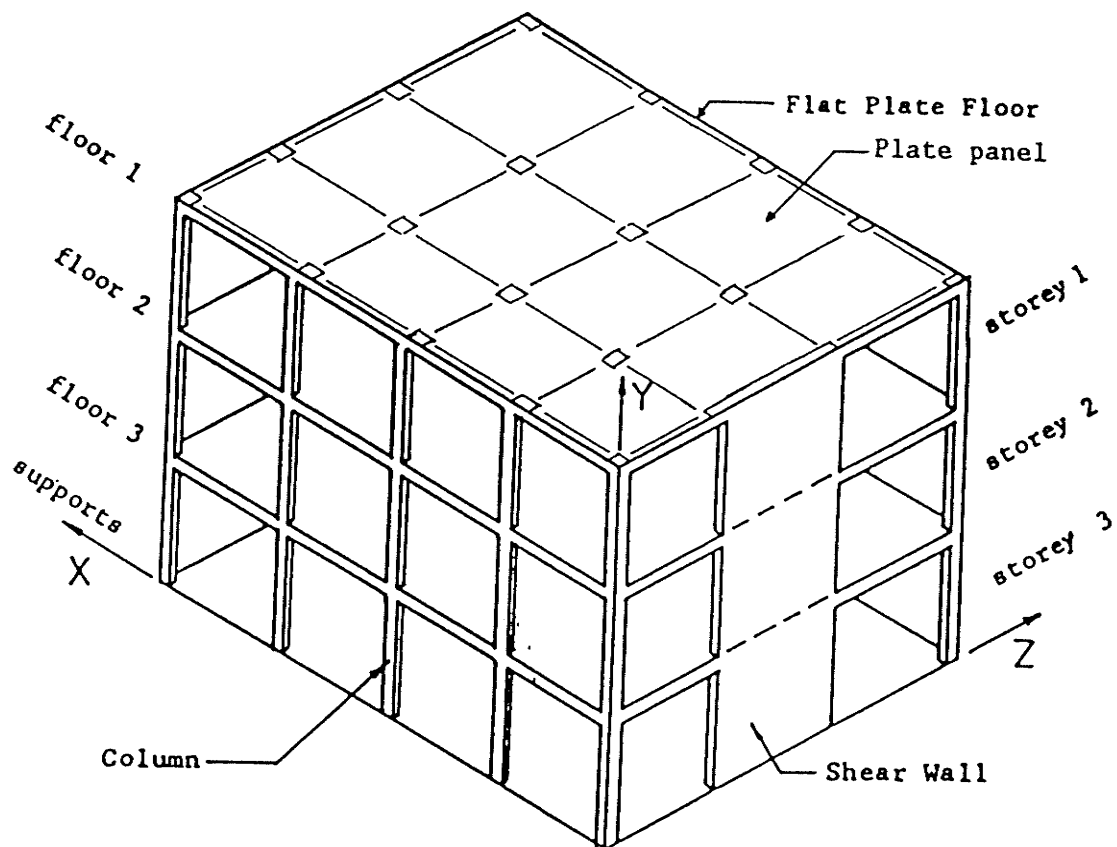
Typical Flat-Plate Structure With Shear Wall
